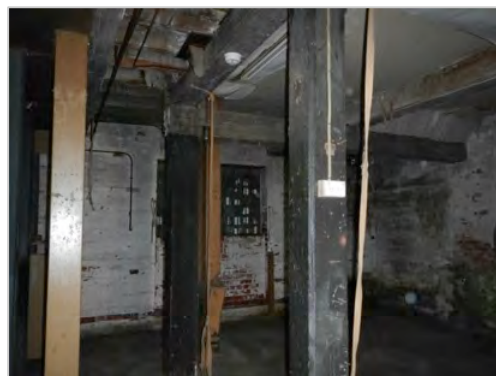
Mill building—ground floor (© Kasiannan, 2015)
